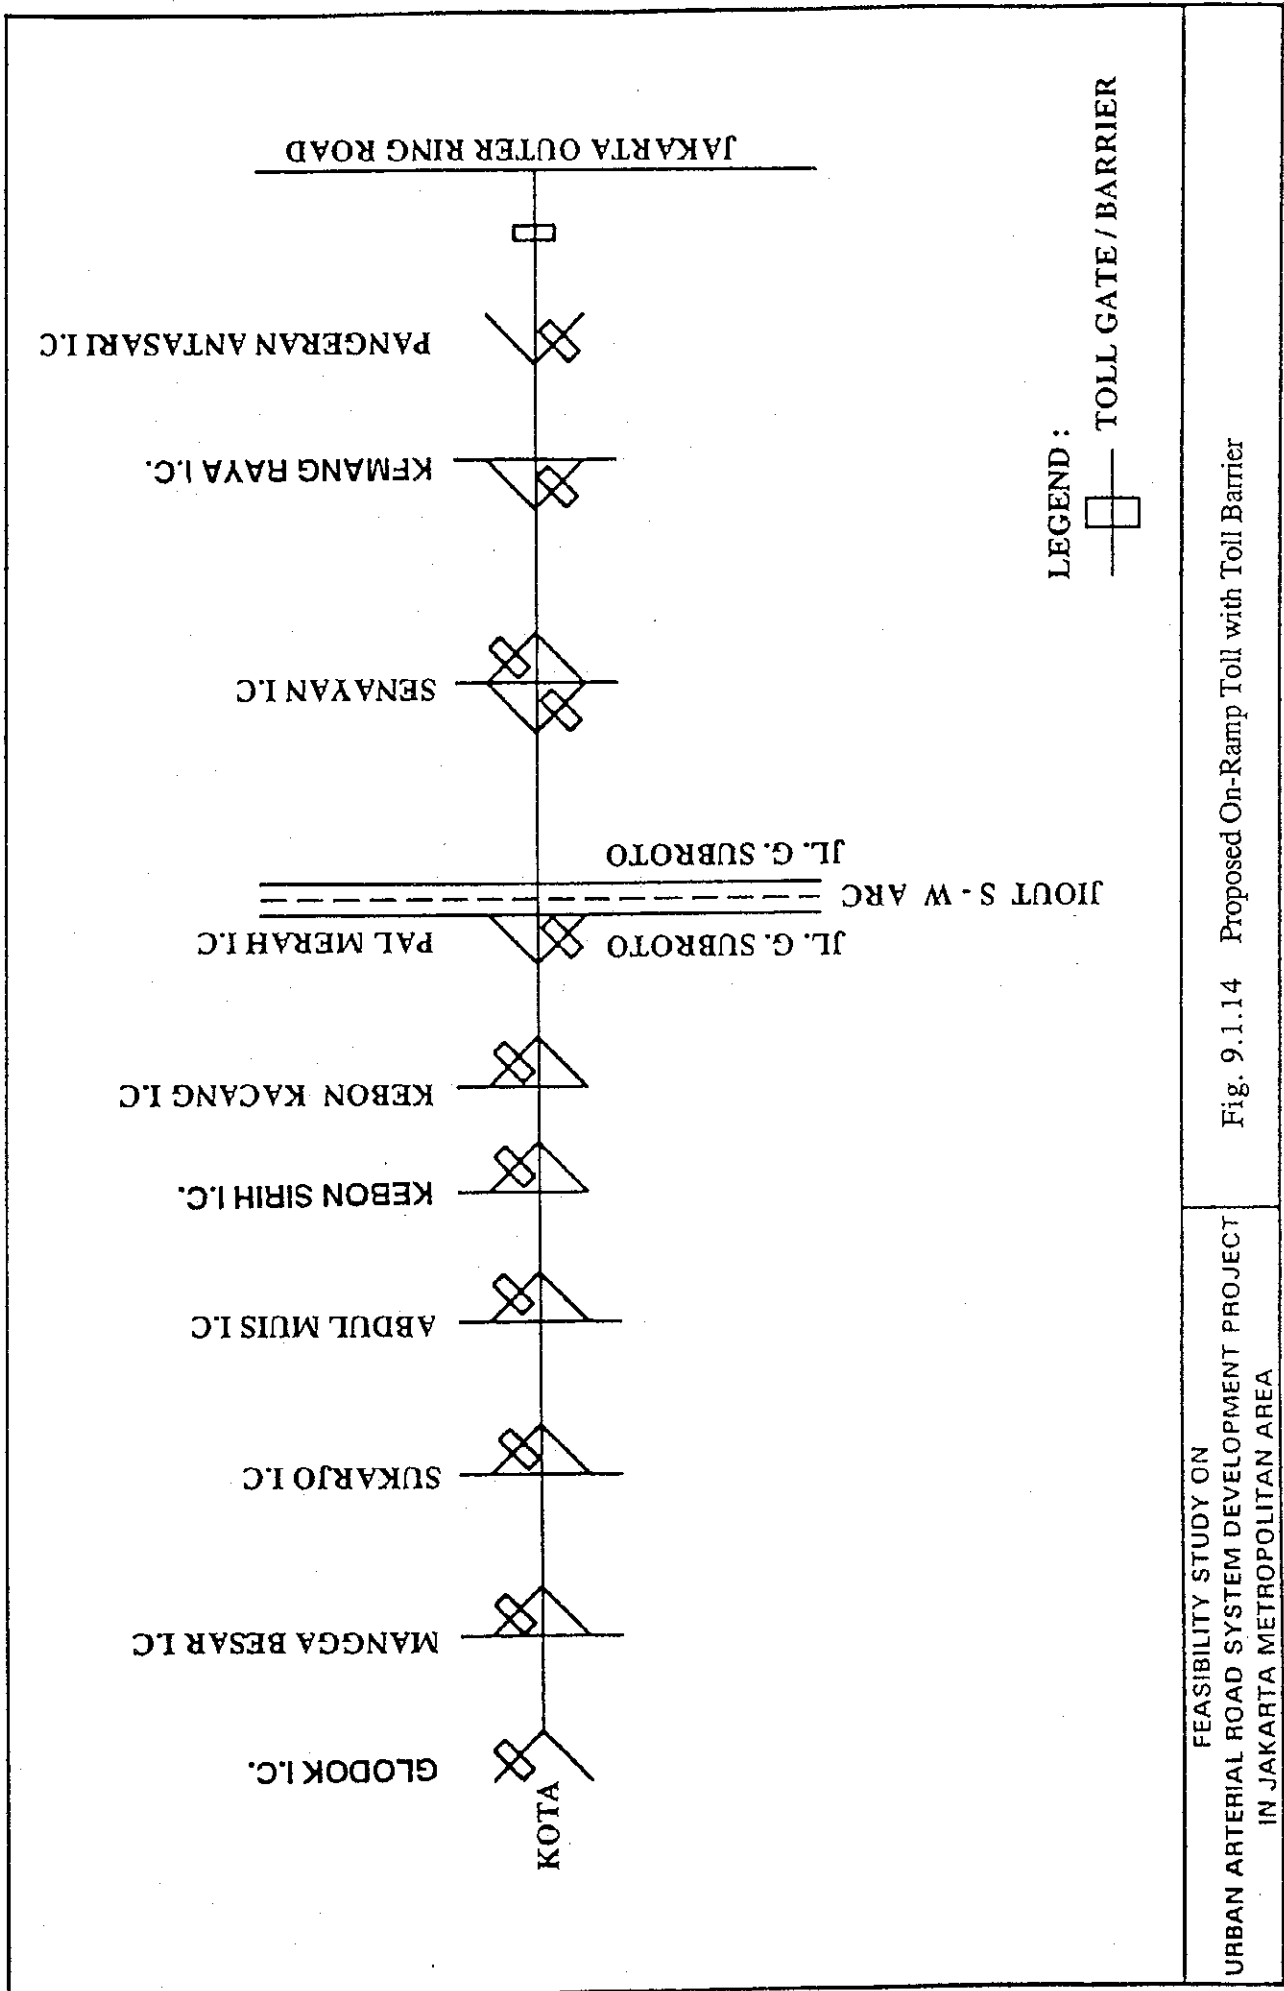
Proposed On-Ramp Toll with Toll Barrier
